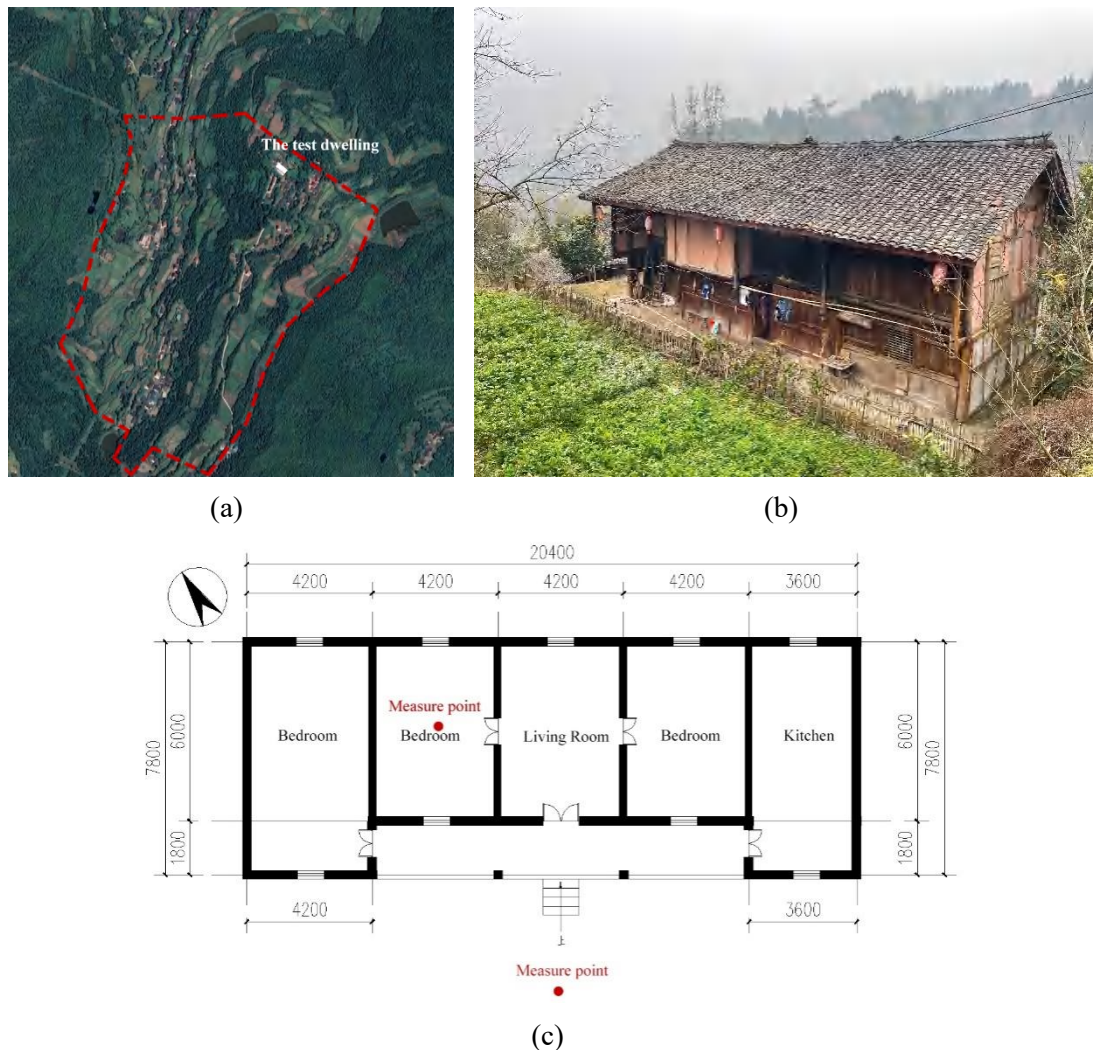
The traditional dwelling in Baishi Village (a) The location of the traditional village (b) The image of the traditional dwelling (c) The plan of the traditional dwelling
